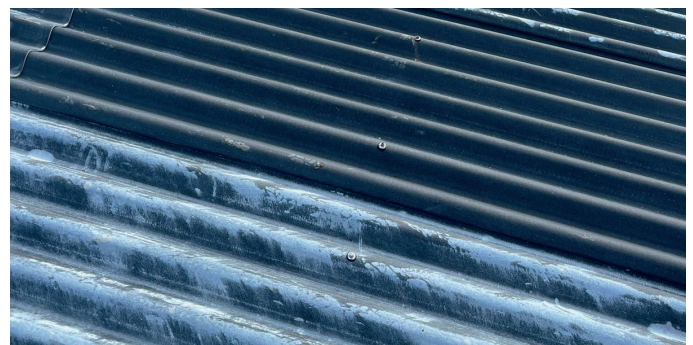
showing Efflorescence transferal caused by walking on the roofing sheet
